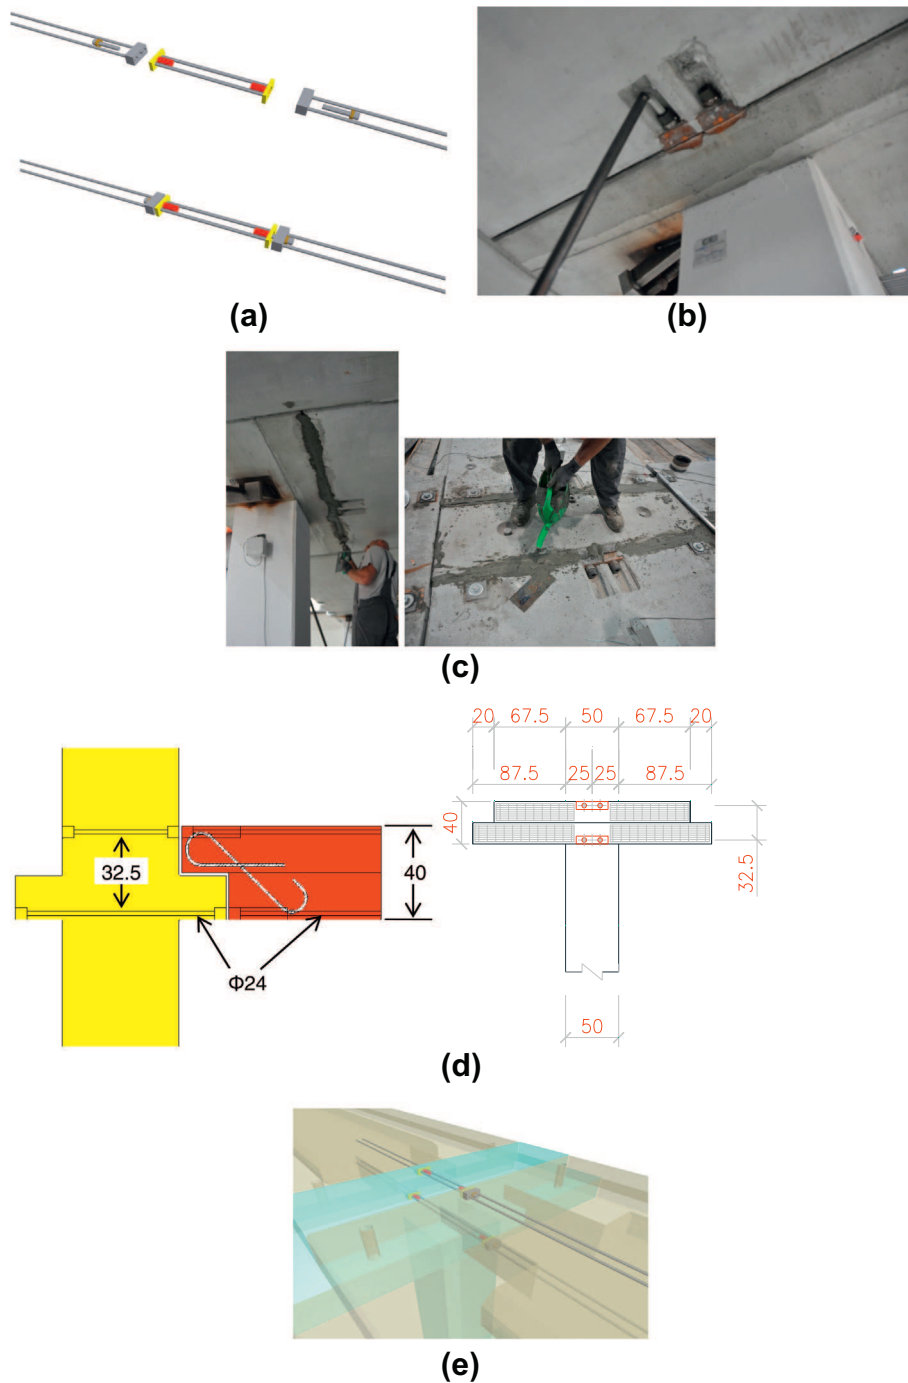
(a) Loosen and activated connection system in its bare configuration. (b) Activation of the loosen bolts to provide continuity to the longitudinal bars crossing the beam–column joint. (c) Filling the gaps in the joints with mortar. (d) Detail of an emulative beam–column joint. (e) Three-dimensional representation of the mechanical connector in a central beam–column joint.
